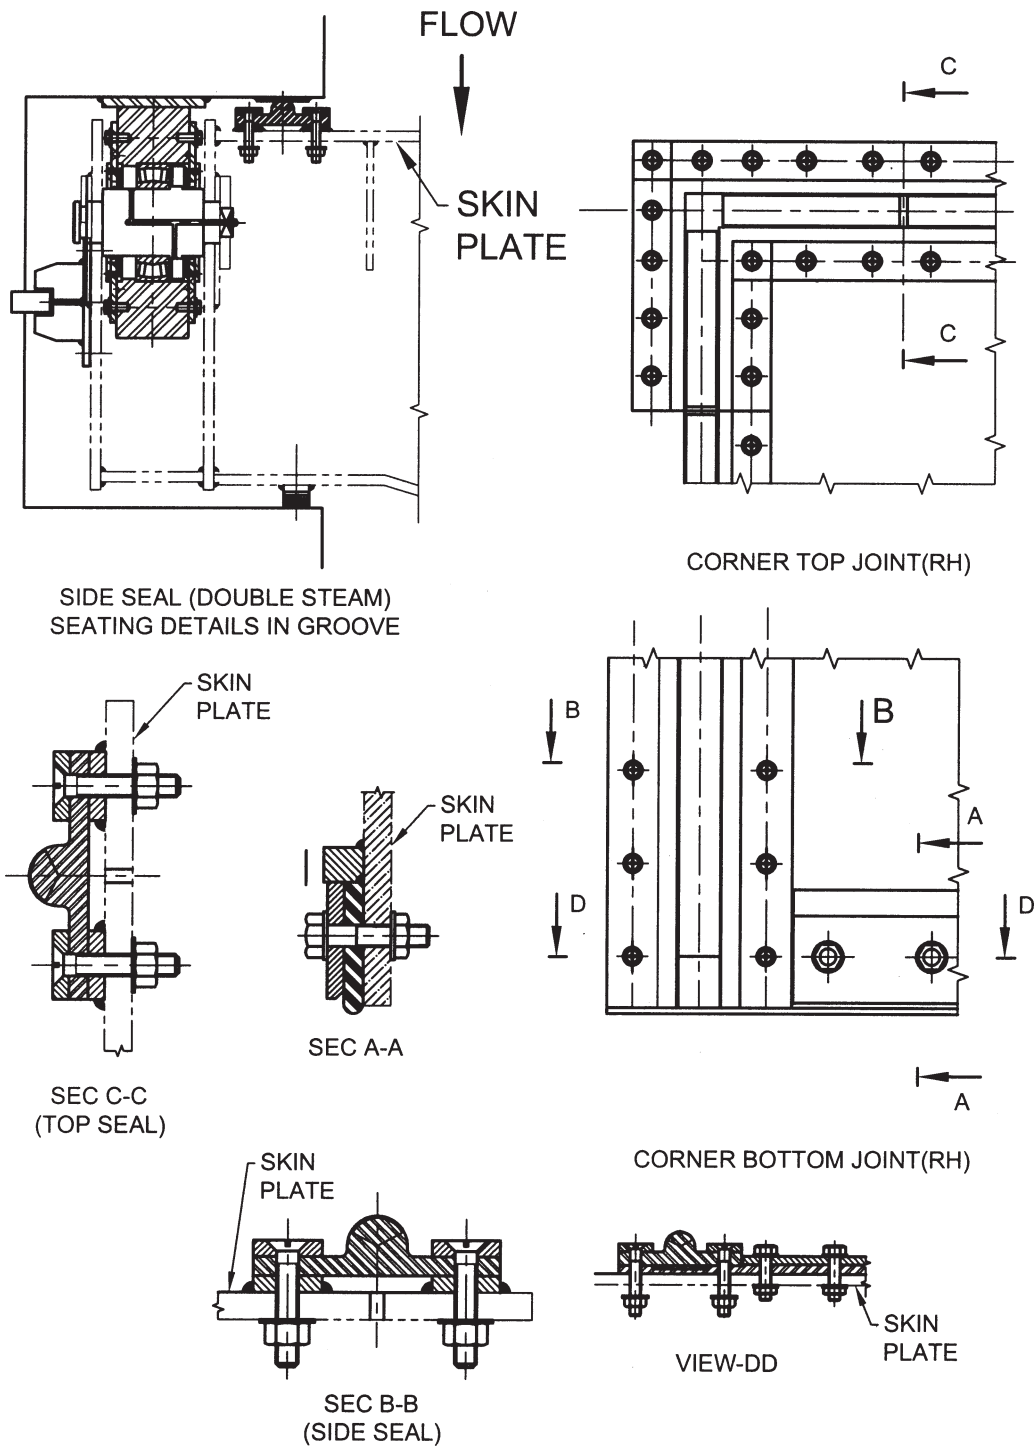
SIDE (DOUBLE STEM), TOP AND BOTTOM SEAL JOINTS (DOWN STREAM)
